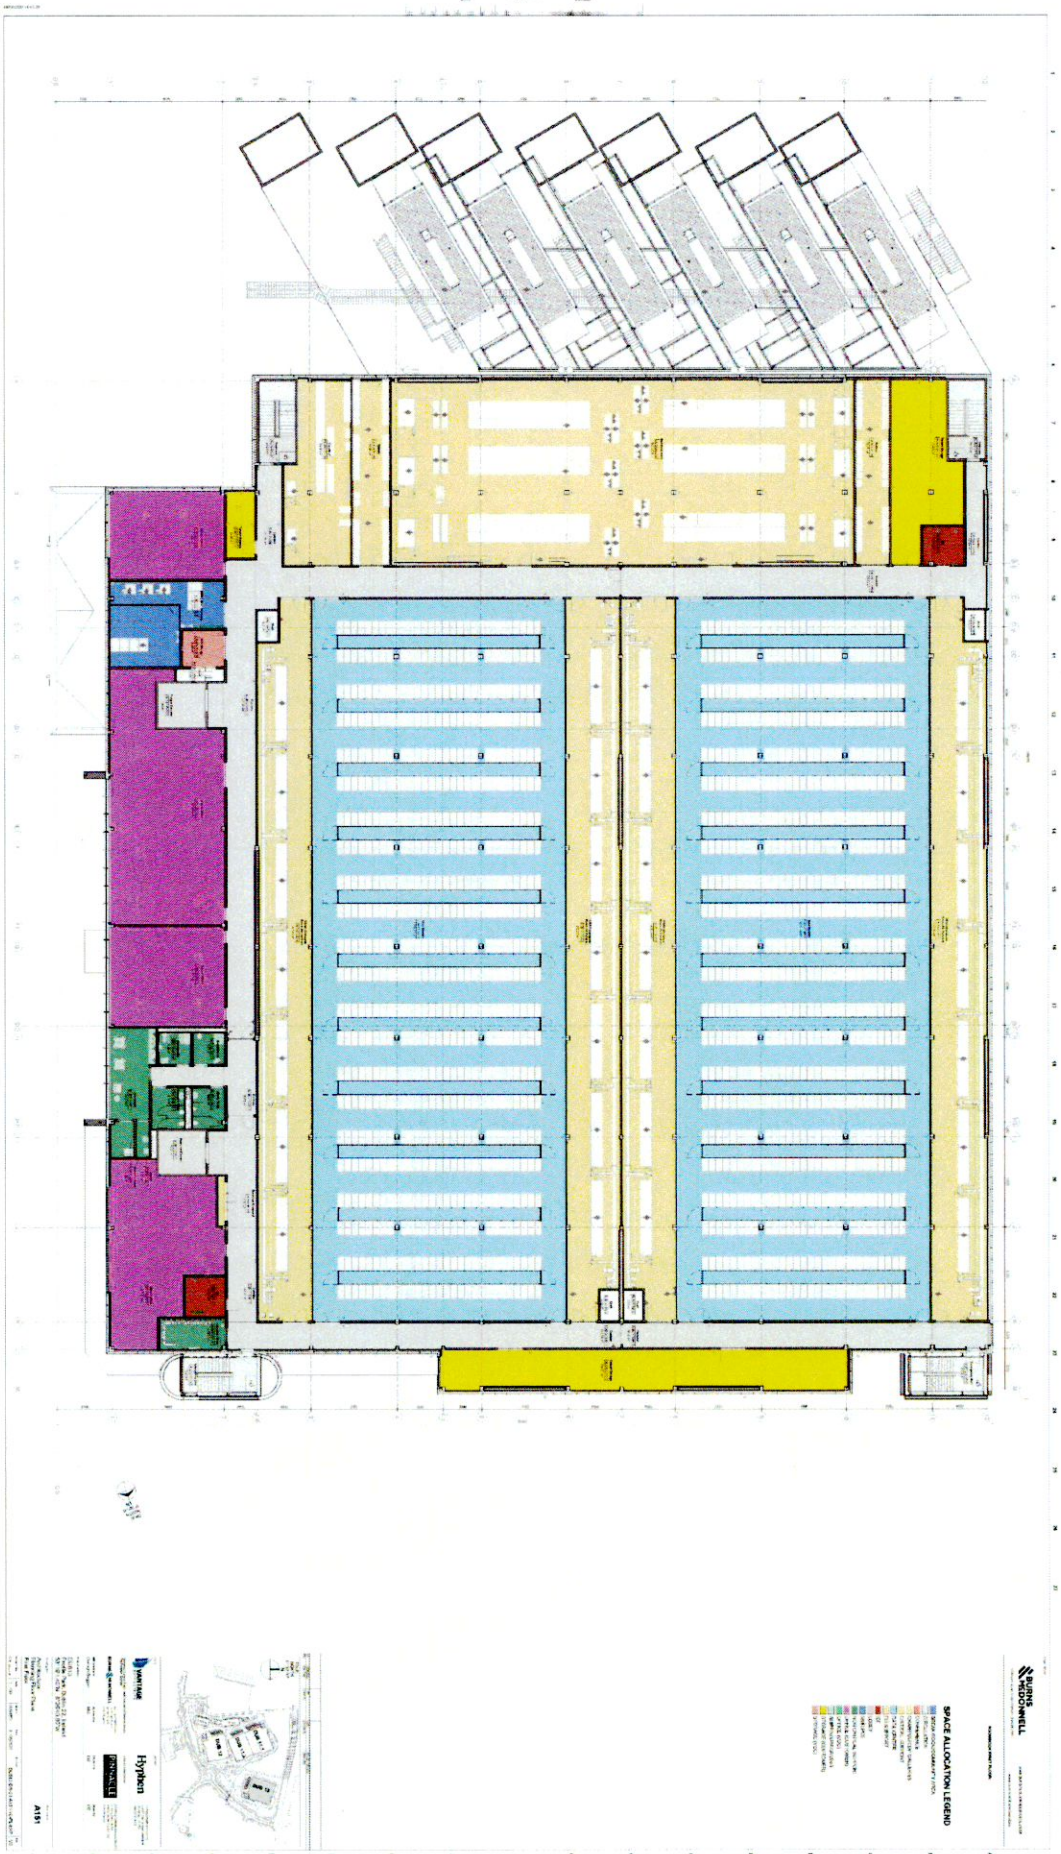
Proposed First Floor General Arrangement Plan (Source Burns & McDonnell)
